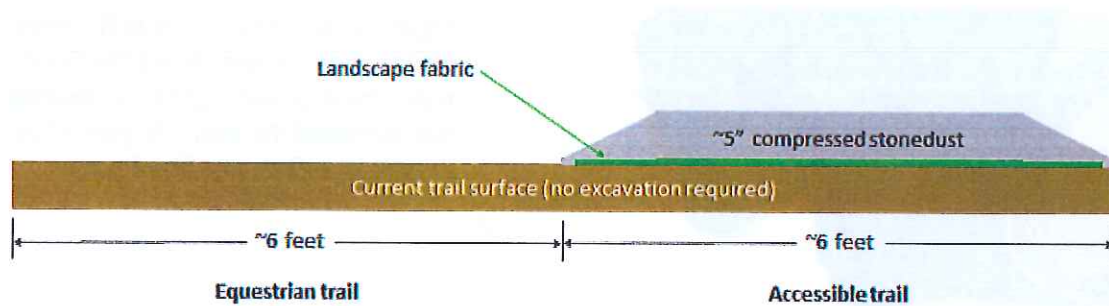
Cross section of parallel equestrian and accessible trails where they run parallel to each other for the first 600 feet of the Nashua Riverwalk.
